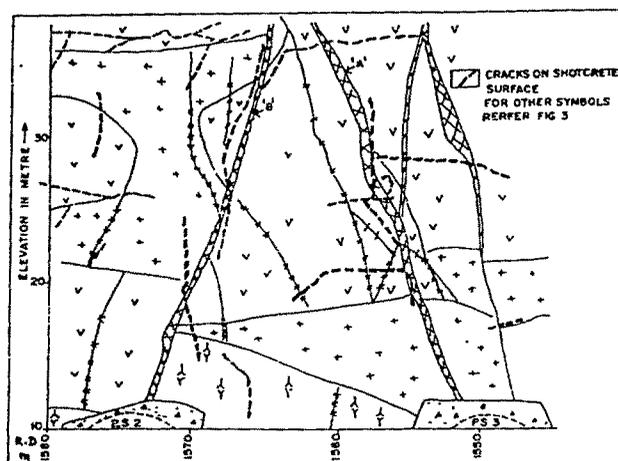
PART OF UPSTREAM FACE OF THE MACHINE HALL SHOWING DISPOSITION OF CRACKS
